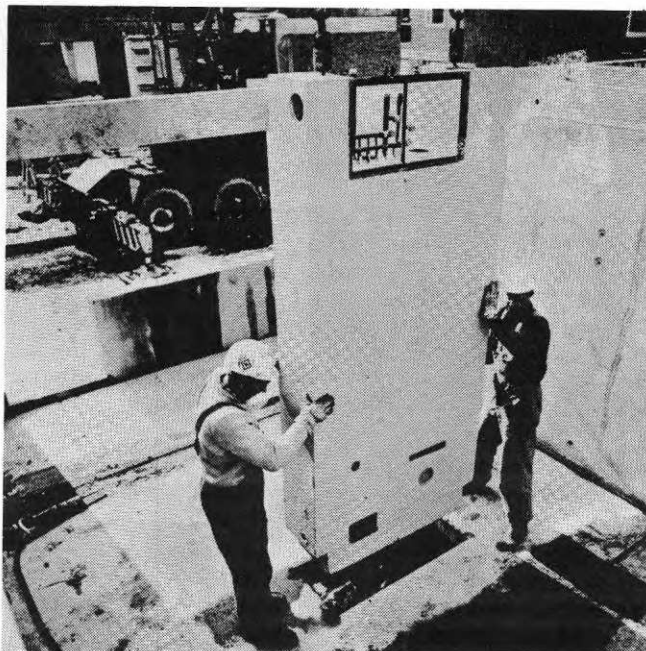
One simple movement and all installations for water supply, waste evacuation and ventilation are in place. Erection of prefabricated "wet" wall manufactured by AB Nils P. Lundh, Gothenburg.
